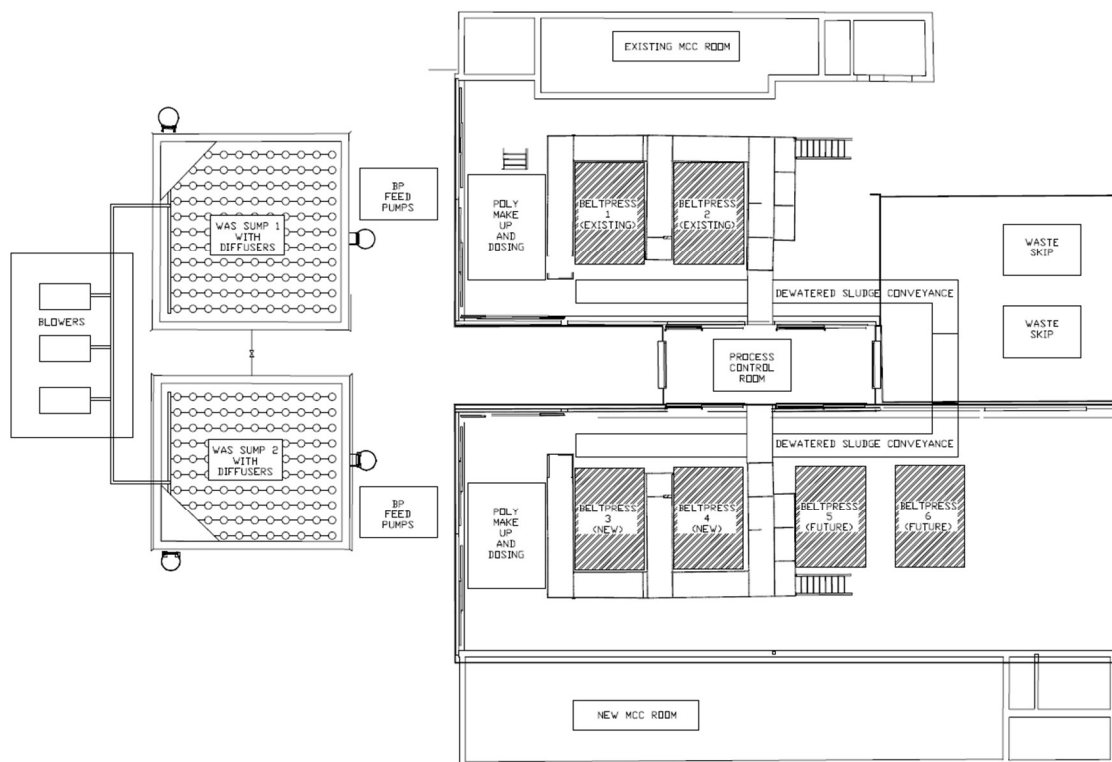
Concept Layout of upgraded WAS Dewatering Plant
